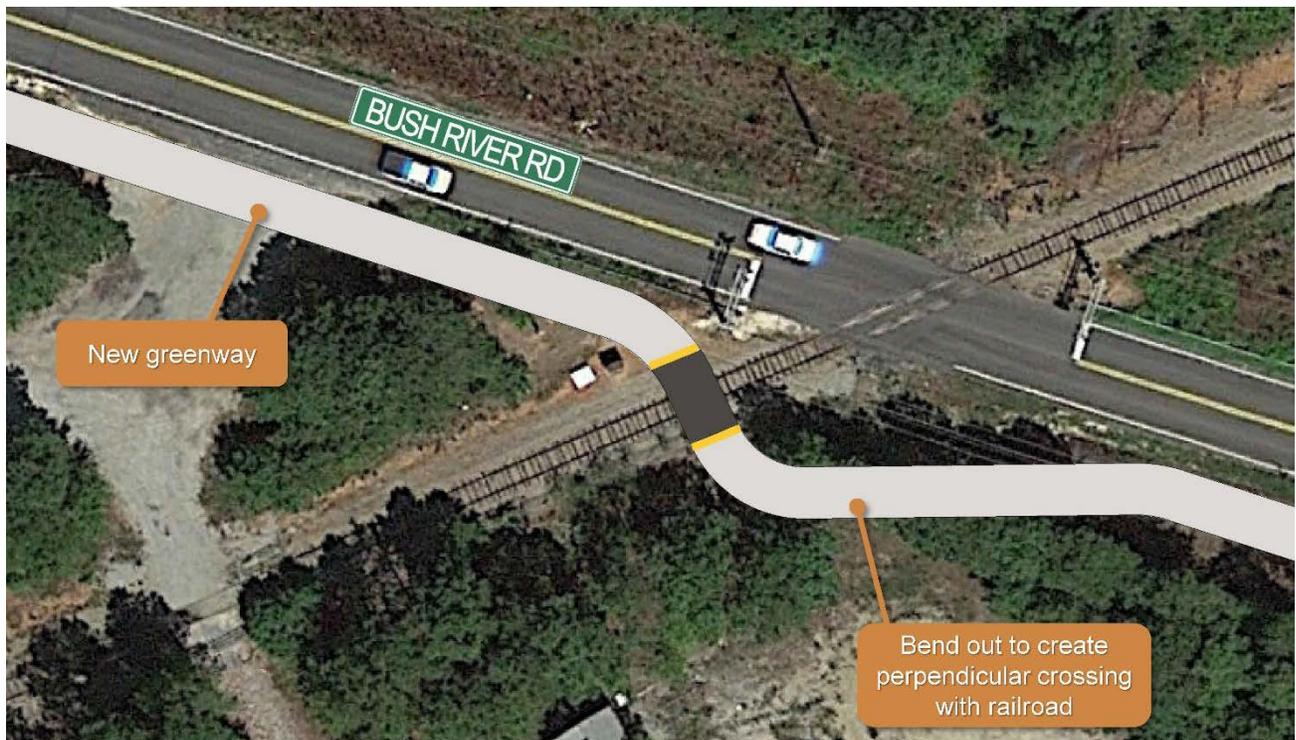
| At-grade Railroad Crossing Conceptual Improvement
